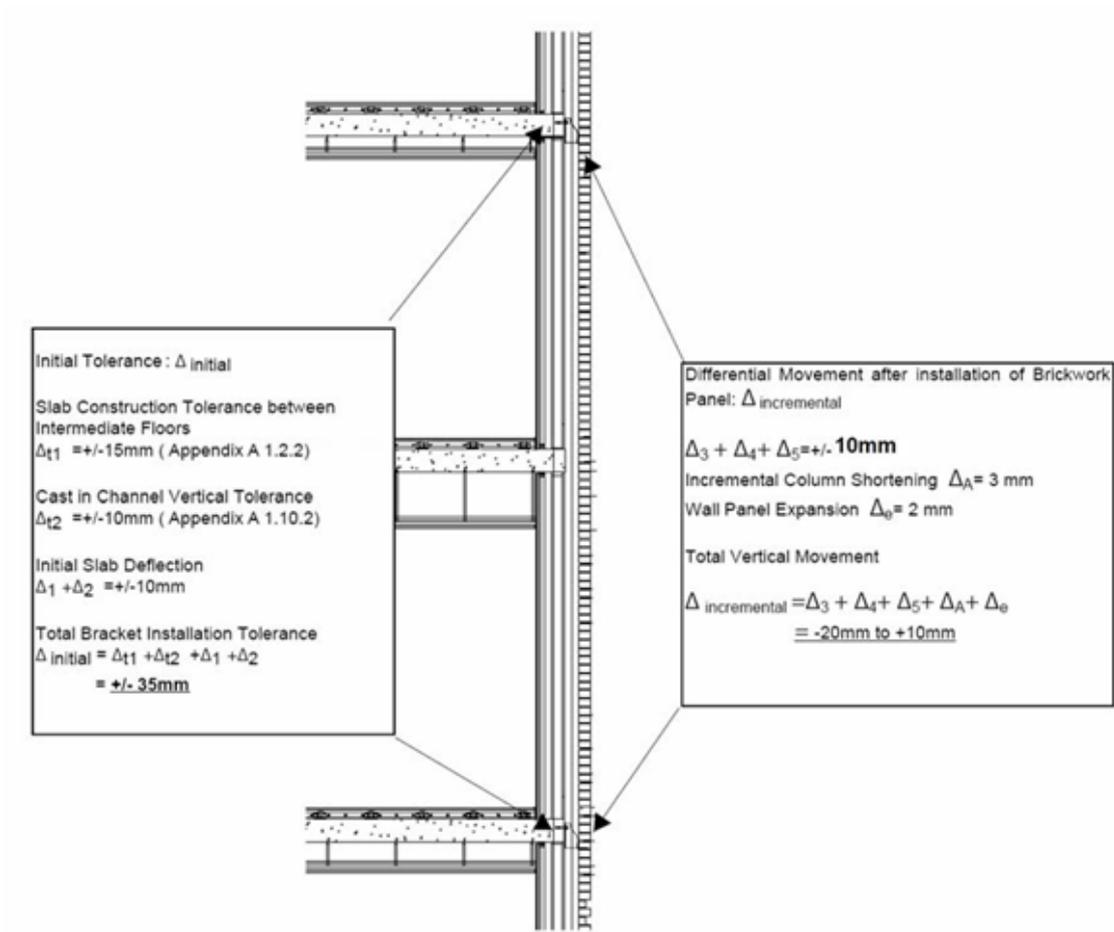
Brickwork Façade Supporting at the Concrete Slab Edge
